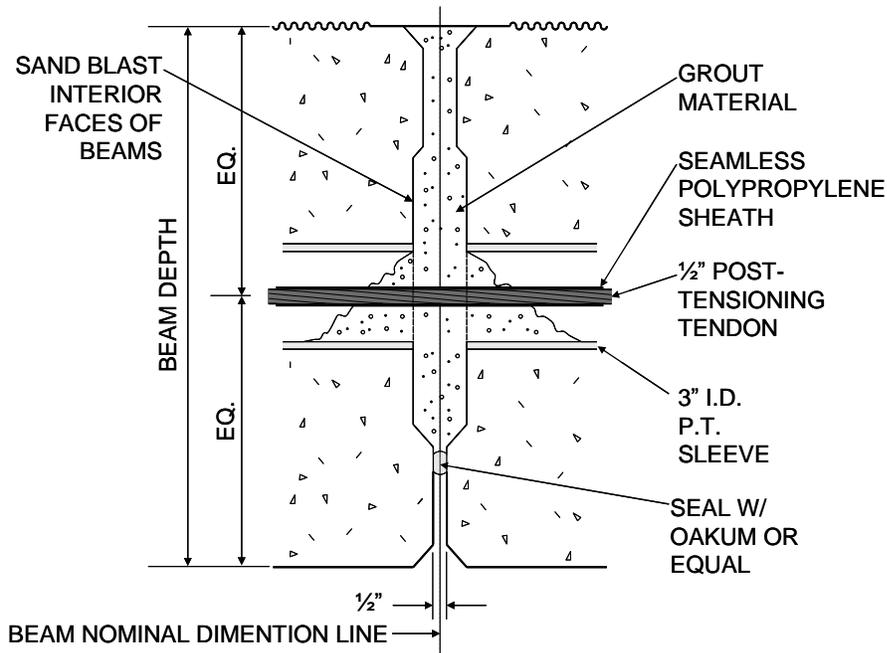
1 Longitudinal joint section at transverse tendon.
